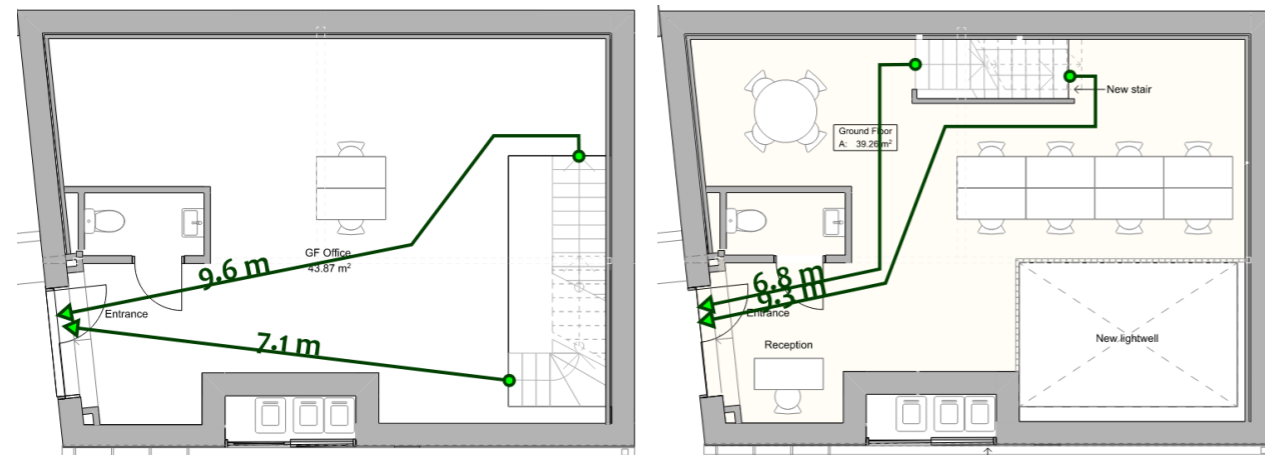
Distances from stair at existing (left) and proposed (right) Ground floor arrangements
